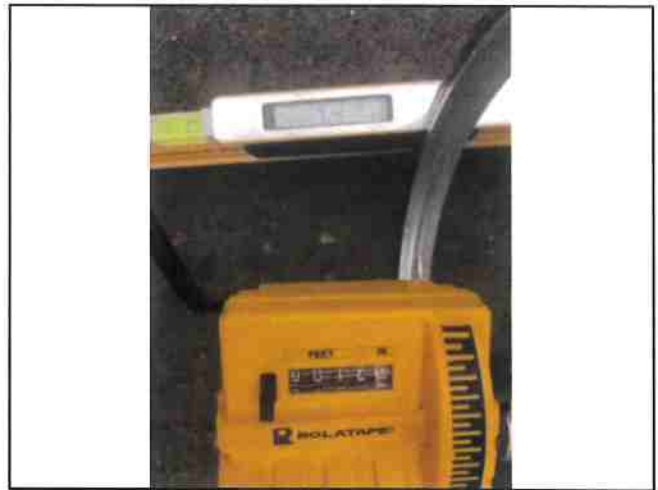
Private Access Rd Slope 7.4% Width 12'7"
